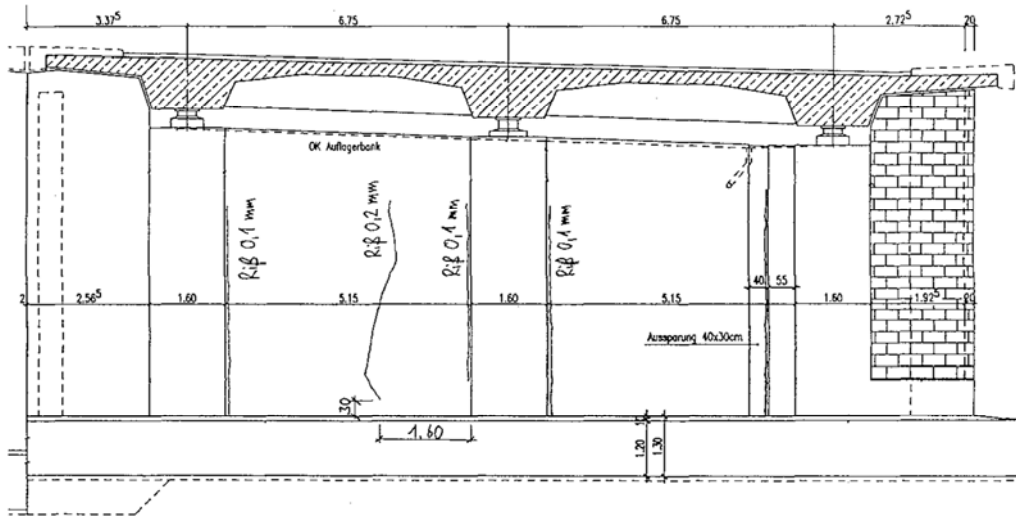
Typical crack pattern of a restrained abutment wall due to the decrease of temperature induced by hydration heat.
